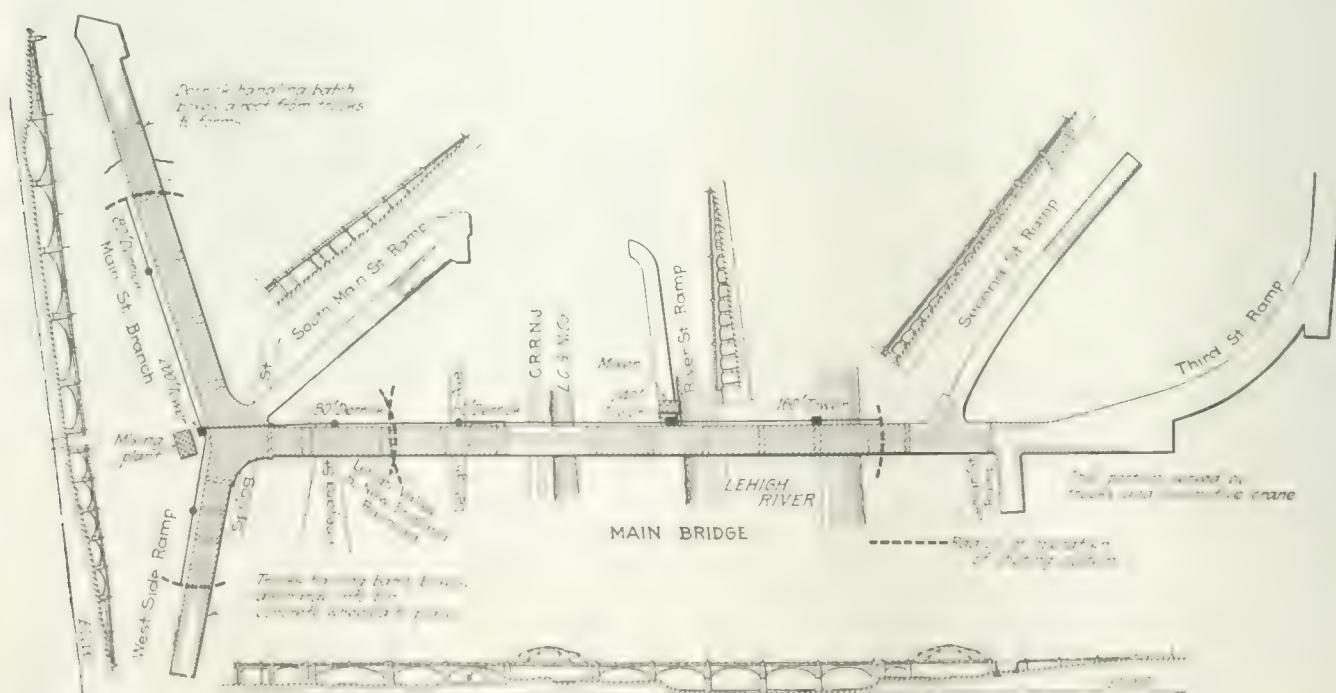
PLAN OF BRIDGE SHOWING METHODS OF CONCRETE PLACEMENT USED
